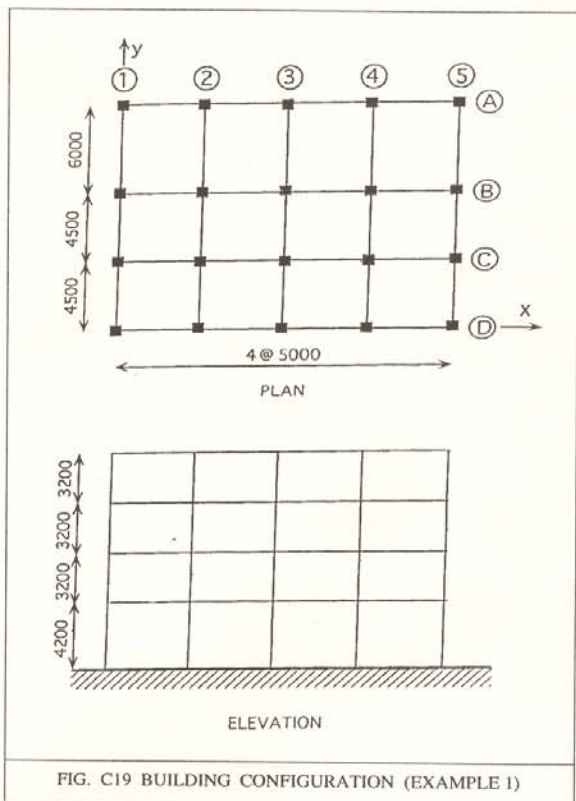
BUILDING CONFIGURATION (EXAMPLE 1)
